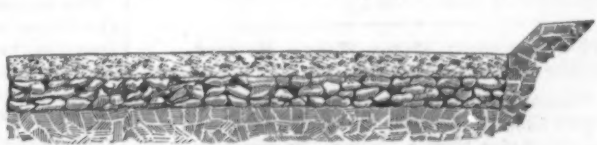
ROAD WITH RUBBLE FOUNDATION.
